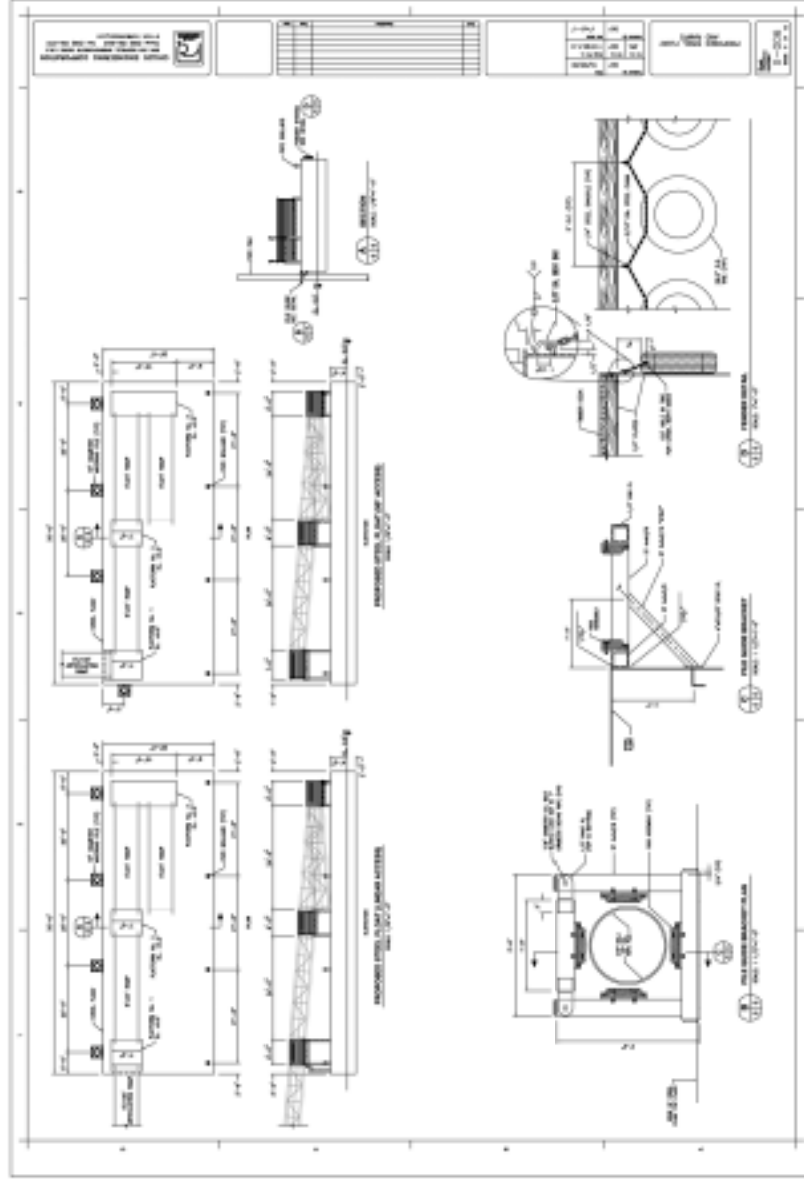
FLOAT AND RAMP ELEVATIONS
